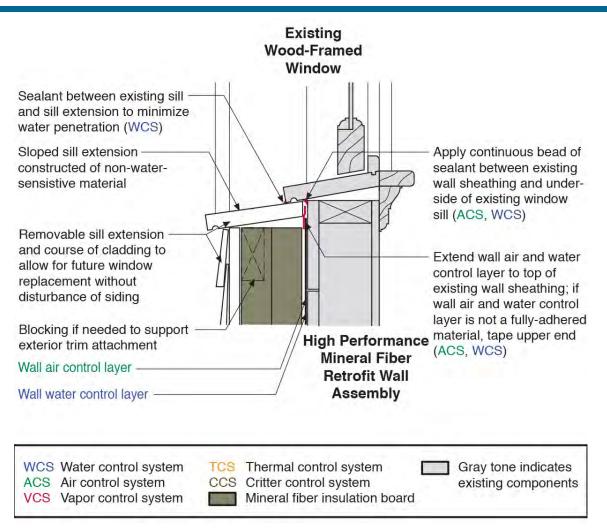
Schematic detail for window sill of an existing window remaining in place in a high performance mineral fiber retrofit wall assembly
